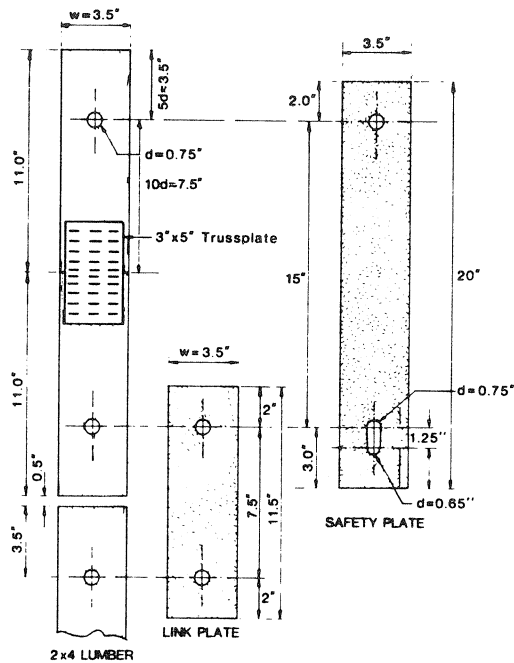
Specimen and linkage dimensions for testing truss-plate joints in tension.
